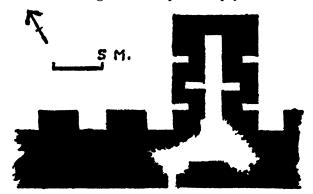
Buhen. Outer town wall. Plan of added tower. After Emery, Kush 7, fig. 1.
